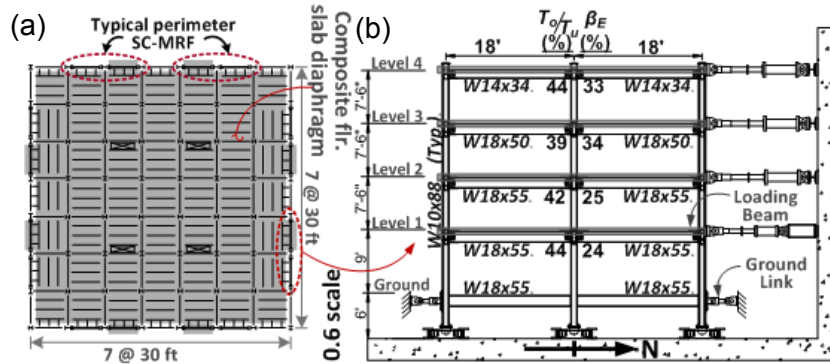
Schematic of (a) plan of prototype, and (b) elevation of 0.6-scale 4-story 2-bay SC-MRF test frame (note: 1' = 1ft. = 305mm; 1"= 1in. = 25.4mm).
